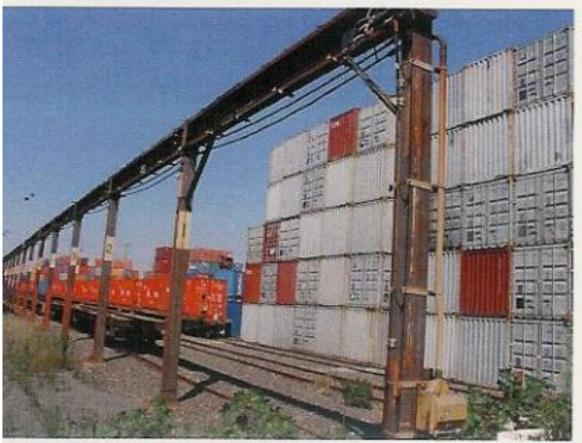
Remnant of electric overhead travelling crane at sidings 1, 2 and 3. Facing south-west. Source. NSW OEH
